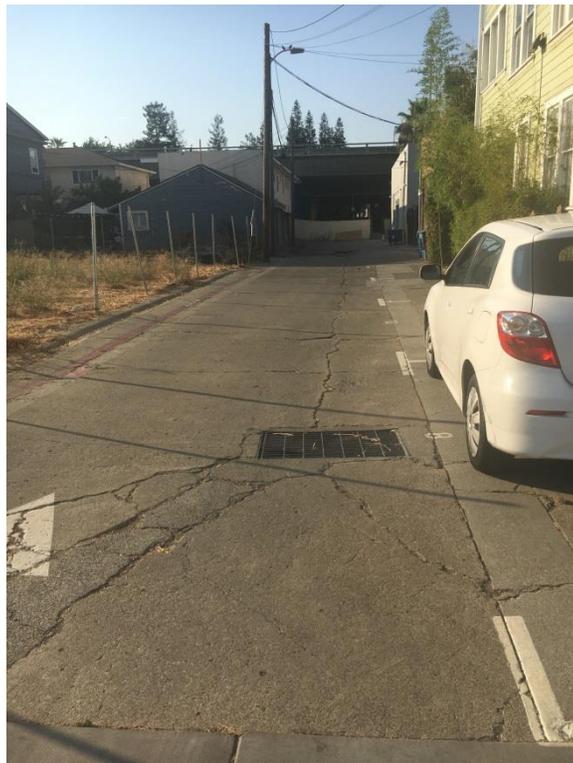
View of the East Reed Street sidewalk and the Site's northern boundary looking northeast towards South 2nd Street
